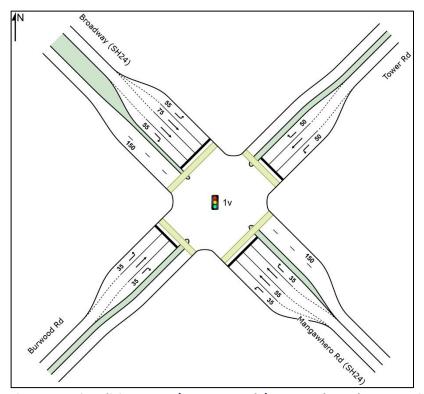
Signalising SH24 / Tower Road / Burwood Road Intersection
